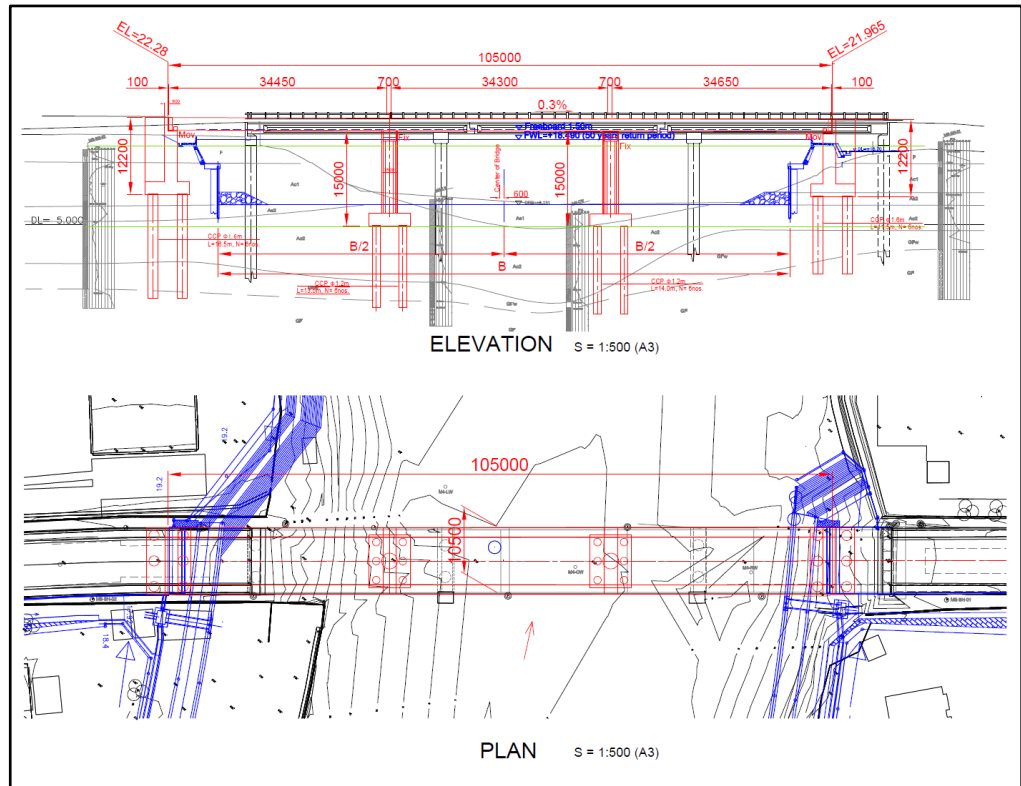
Layout Plan and Cross Section of Manalo Bridge
